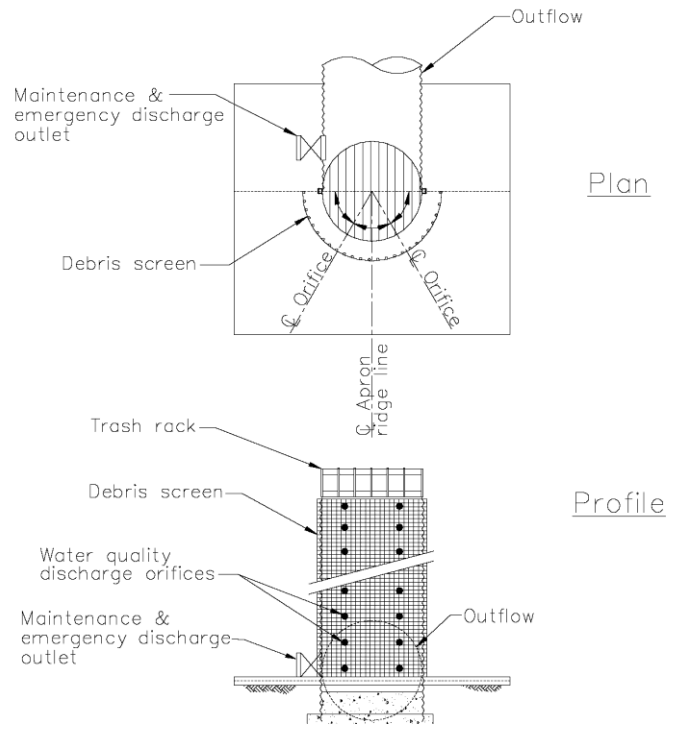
MULTIPLE ORIFICE OUTLET RISER
